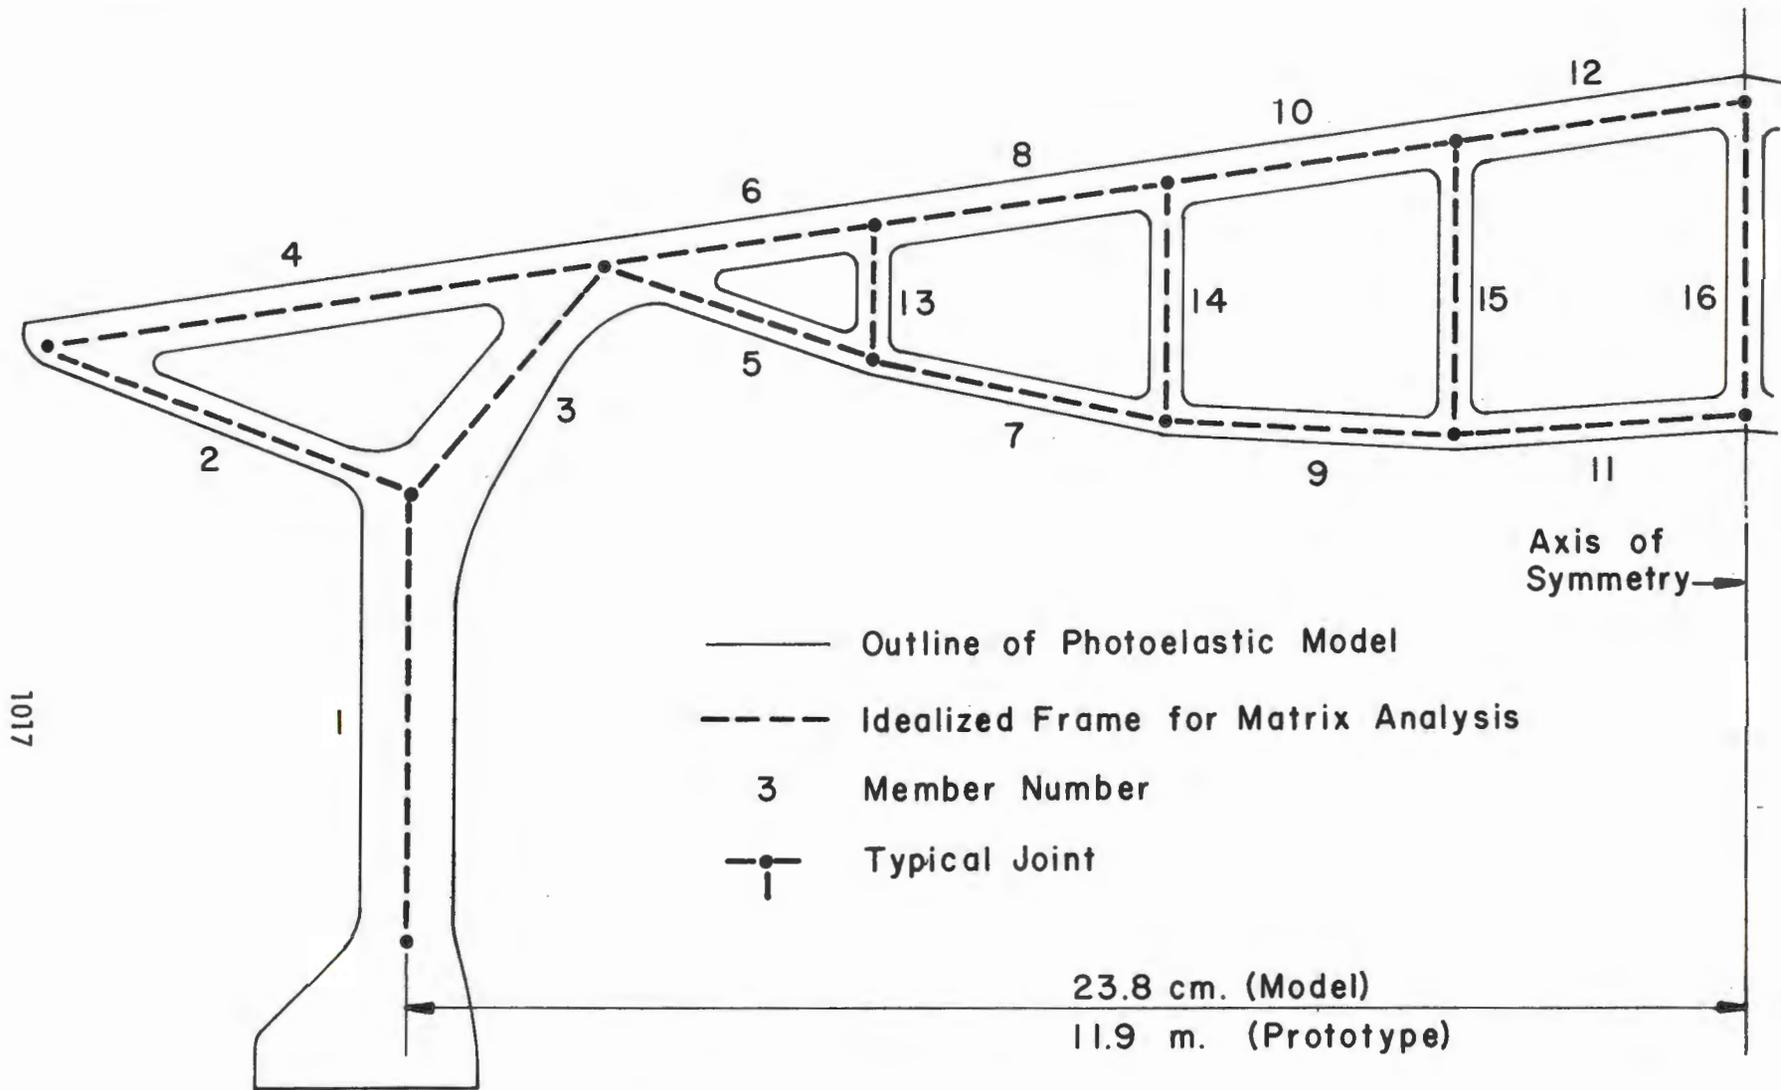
ELEVATION OF MAGAZZINI GENERALI SHED FRAME
